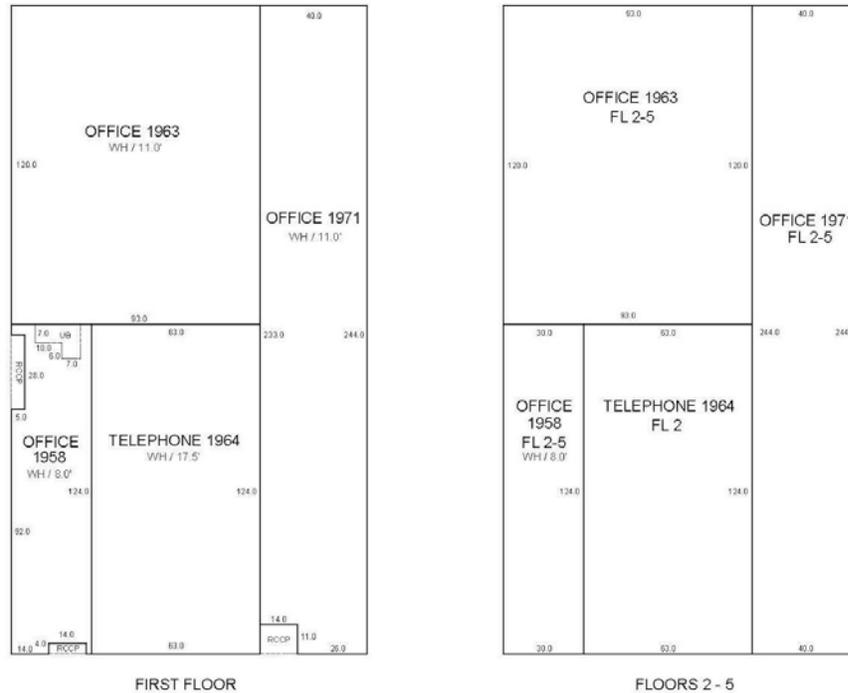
Floor plan for construction additions to Central Telephone Company building. Source: Clark County Assessor's Office Property Sketch
